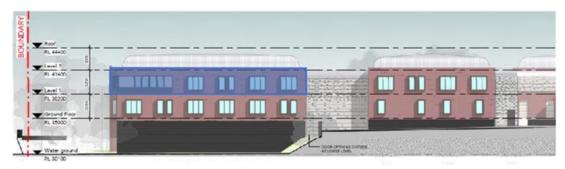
Proposed western elevation, approximate extent of breach highlighted blue (Source: Team 2 Architects)
